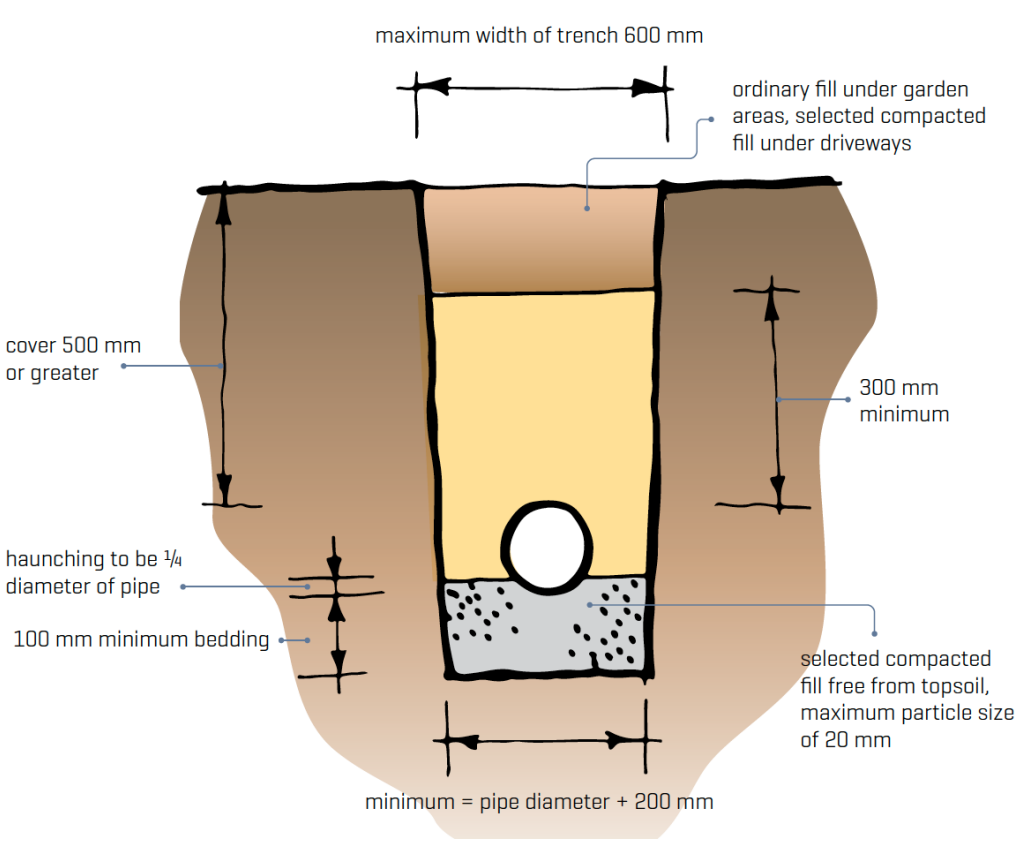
Bedding and backfilling where cover over drain is 500 mm or greater.
